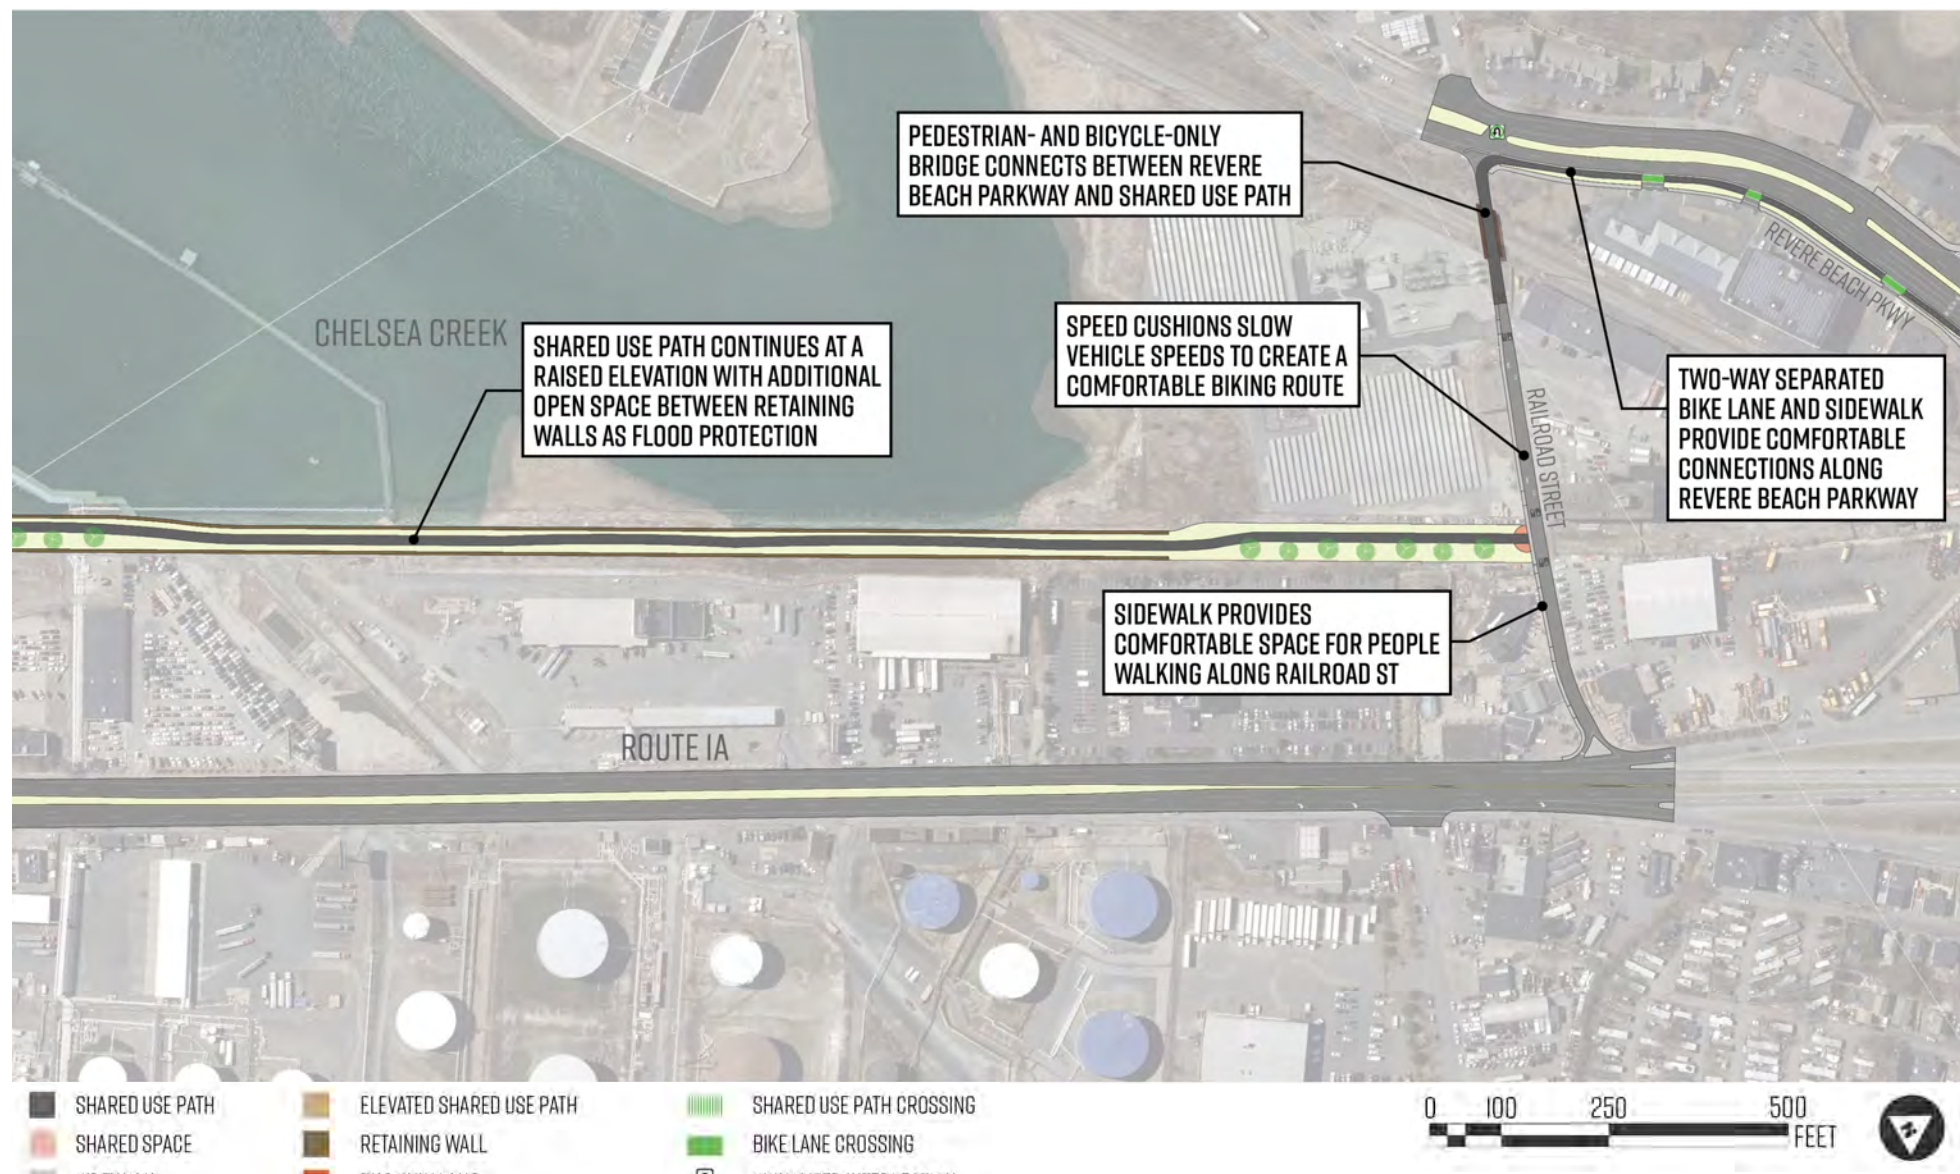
Shared Use Path (Both Alternatives) – North of Jughandle to Railroad Street
